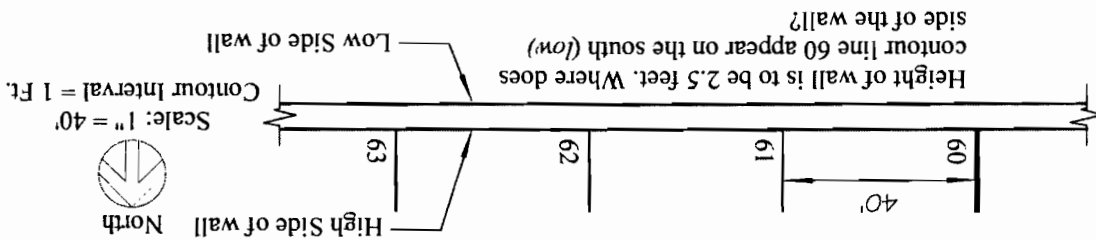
shows a retaining wall with contour lines located on the high side of the wall. The object is to find the point where contour line 60 will appear on the low (south) side of the retaining wall which is 2'-6" high (note the scale change from 1" = 20' to 1" = 40').
